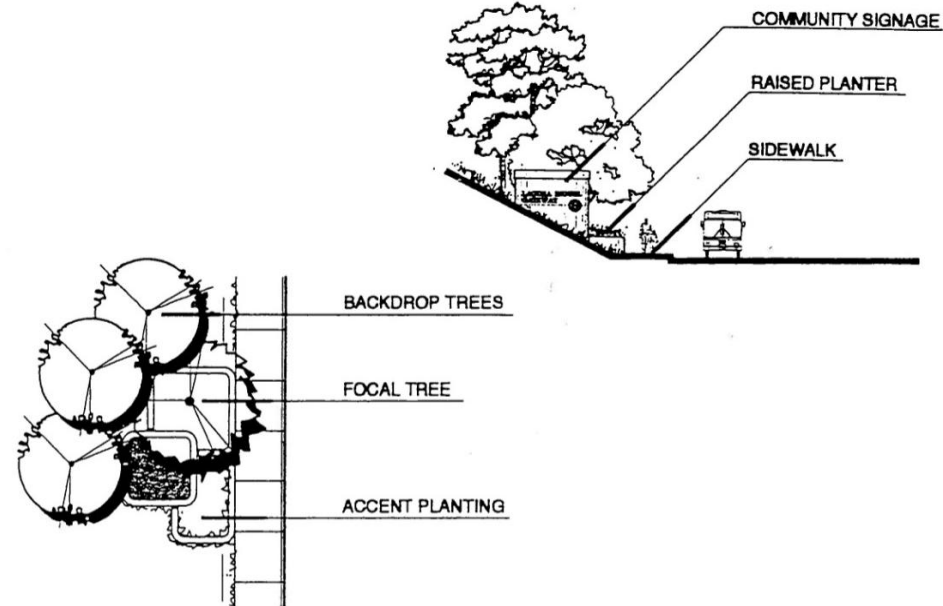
Slopes on West Side of Oso Creek: Typical Plan View and Cross Section
